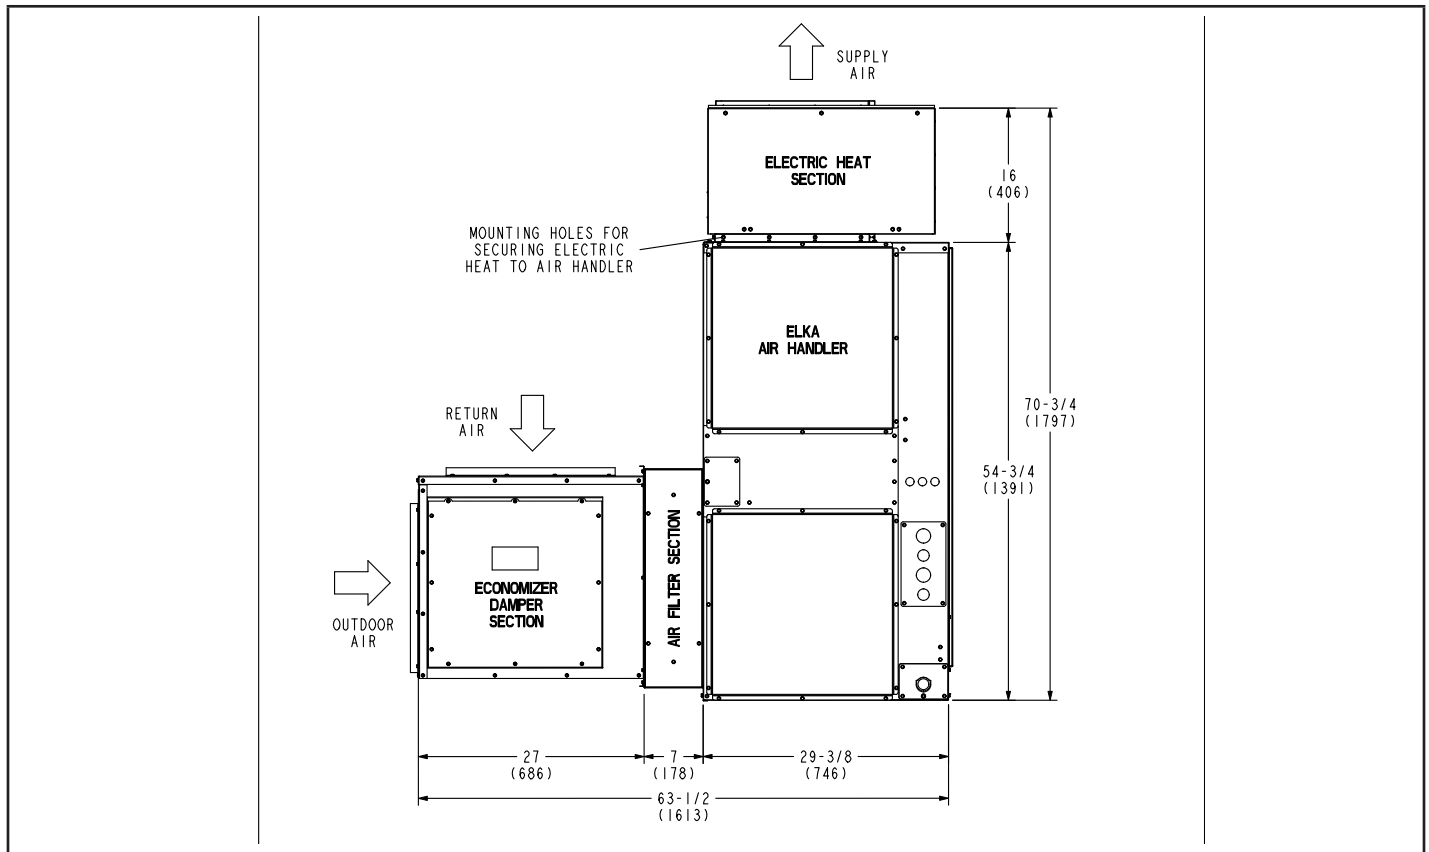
ELKA Upflow Application – Dimensions – Inches (mm)
